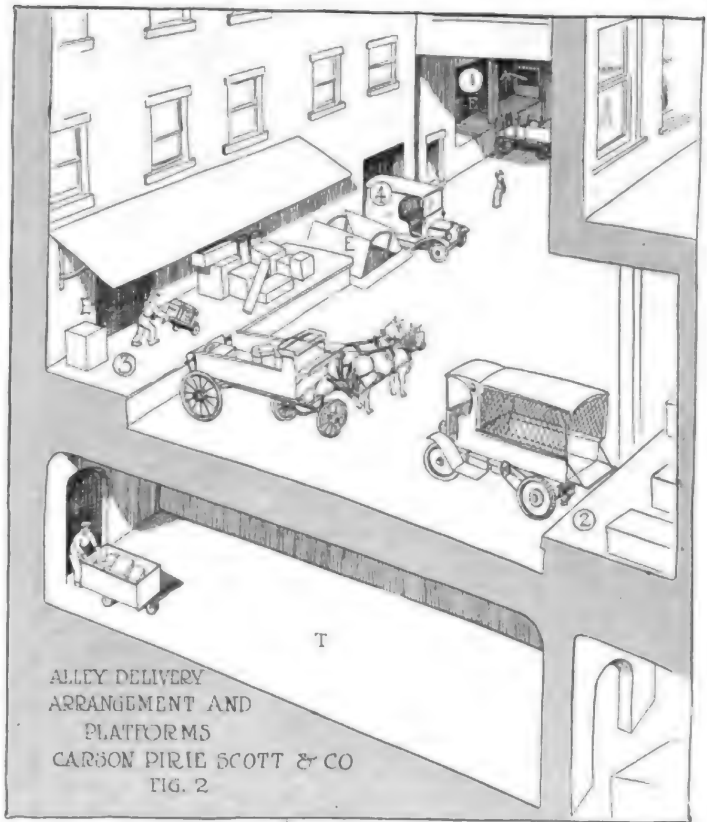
ALLEY DELIVERY ARRANGEMENT AND PLATFORMS AT CARSON, PIRIE, SCOTT & CO.'S.
